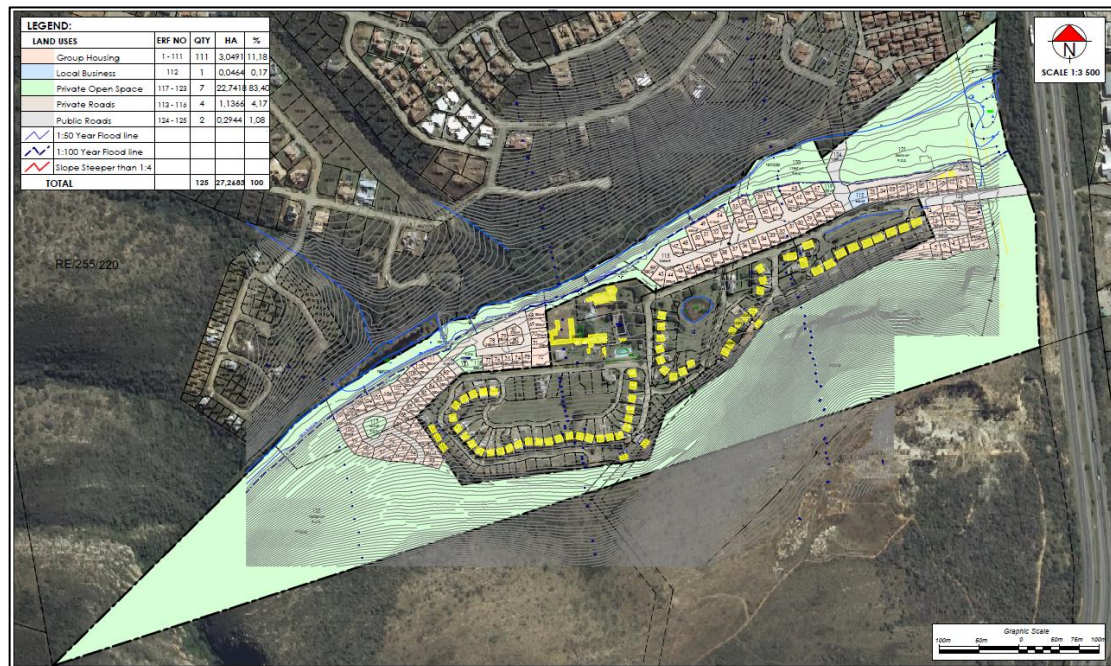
SUBDIVISION PLAN / SITE DEVELOPMENT PLAN (2018)
